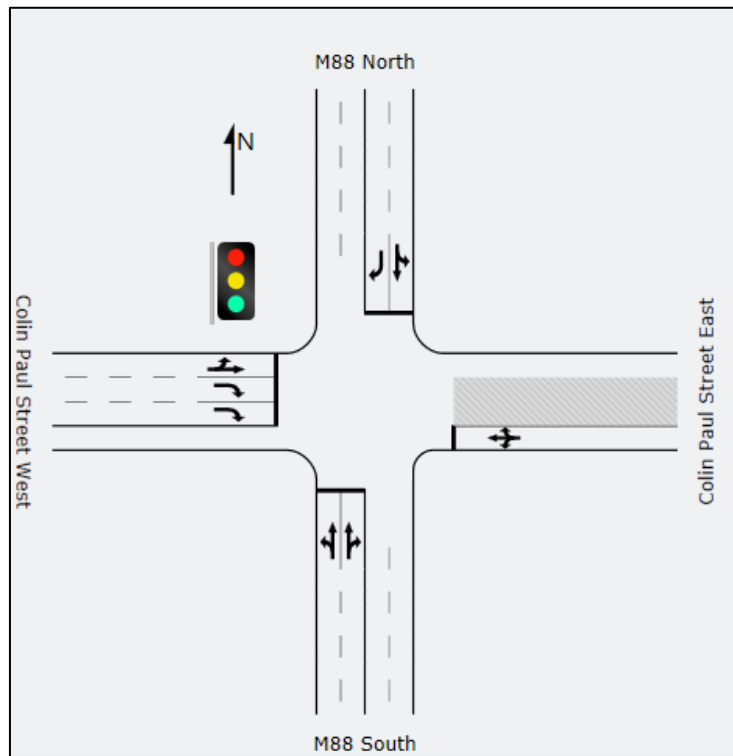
Proposed new layout for Colin Paul Street and M88 ( Rienert Avenue) intersection
